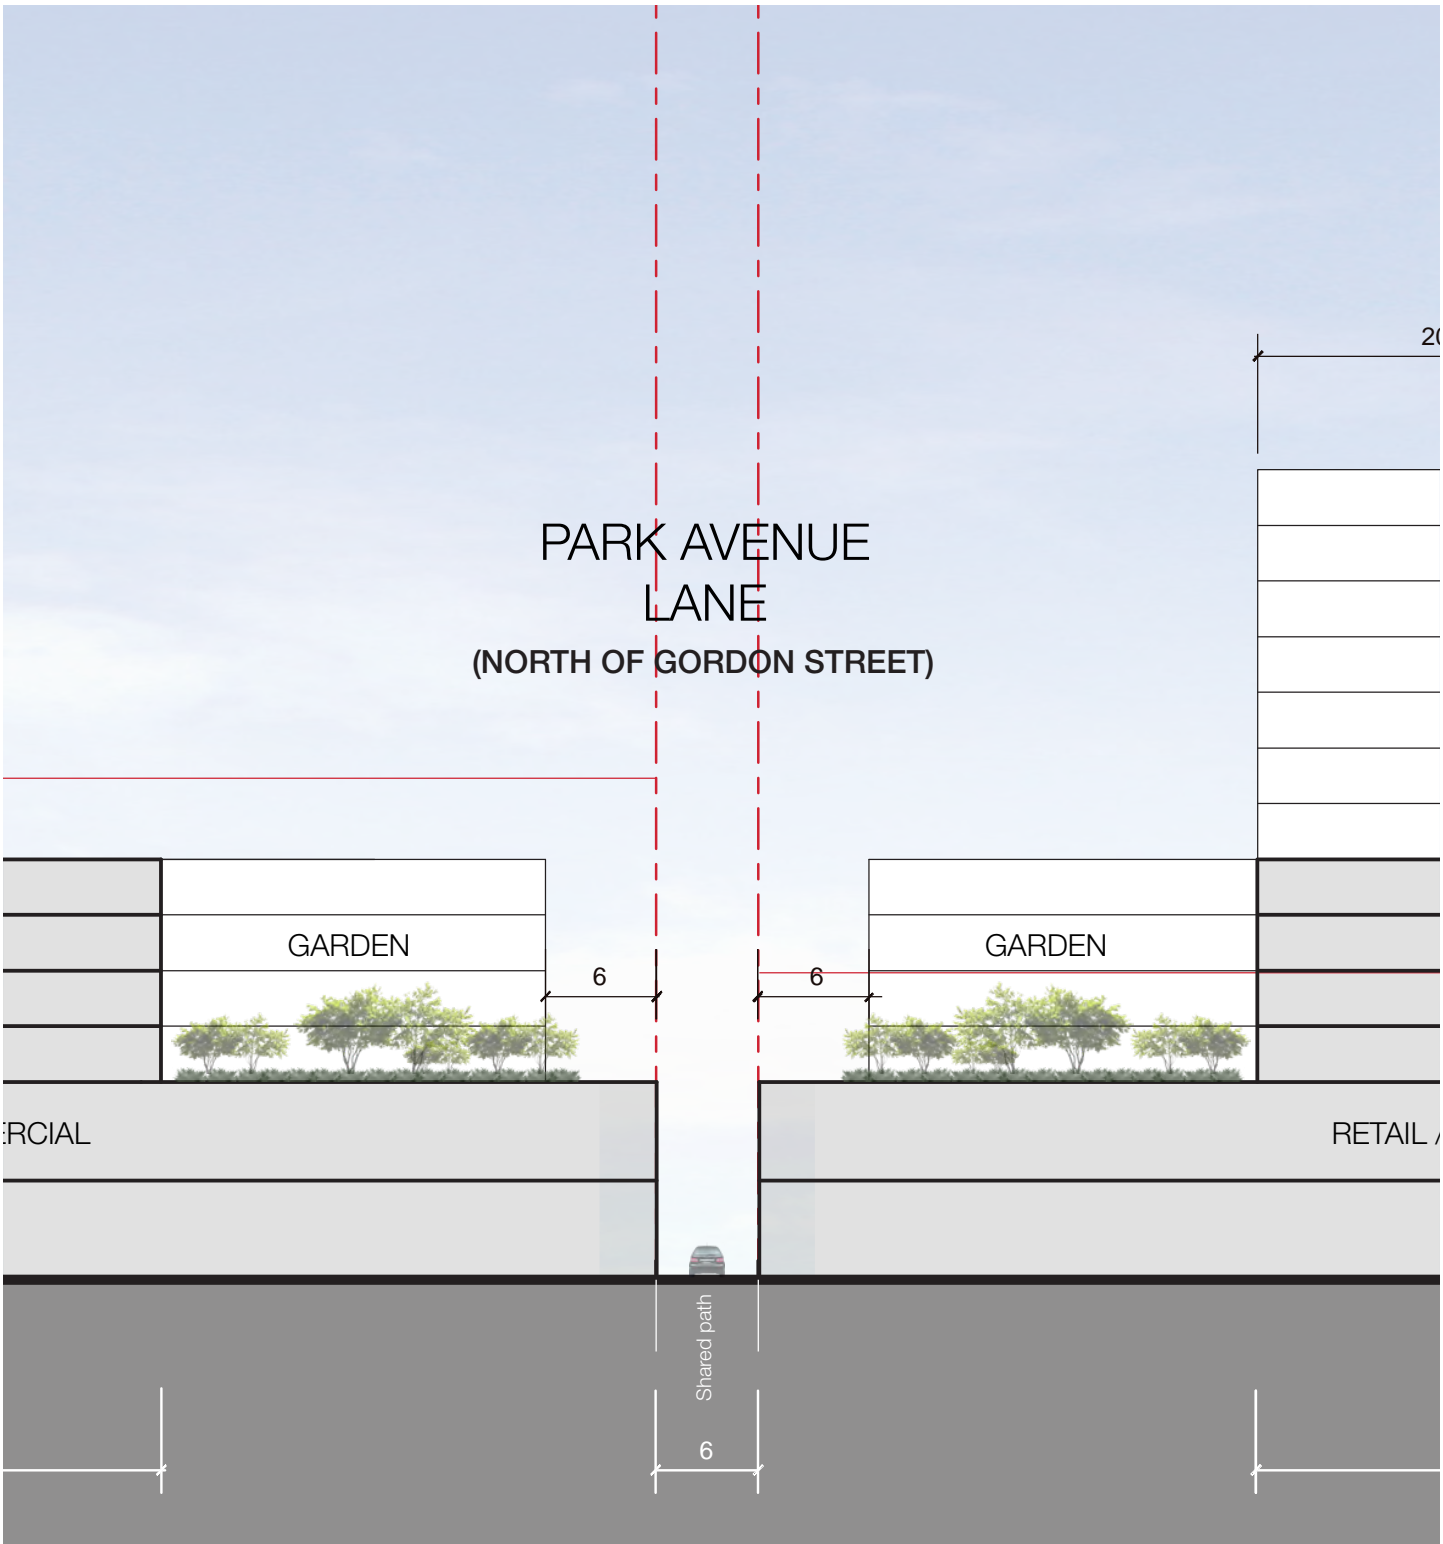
Preferred Built Form Scenario - Typical Park Avenue Lane Cross Section - North of Gordon Street
